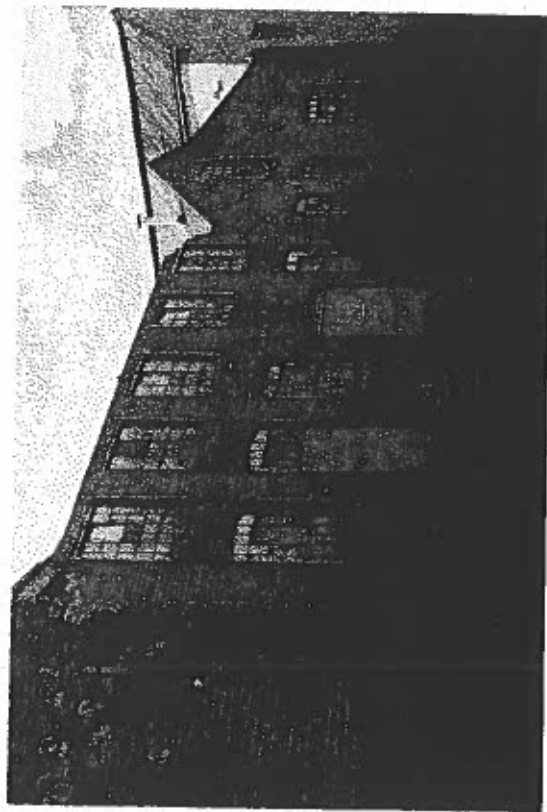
Perimeter wall to former Smethwick Iron Foundry buildings
